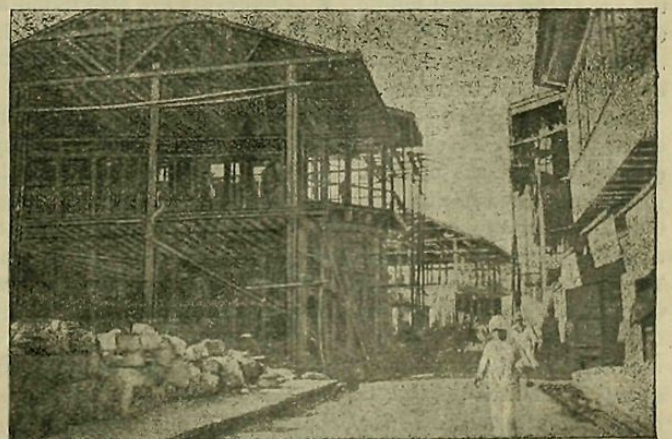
CALLE NUEVA (BUILDING IN COURSE OF ERECTION), MANILA.
